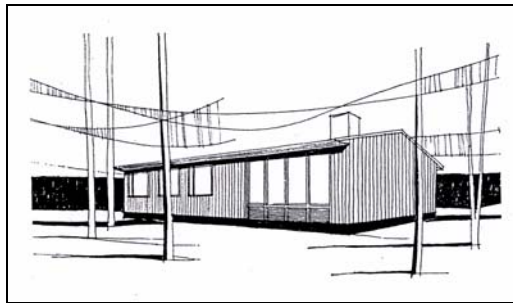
Wooden houses from the 1960 were built into one storey. The houses were made low and the roof gently sloped.
